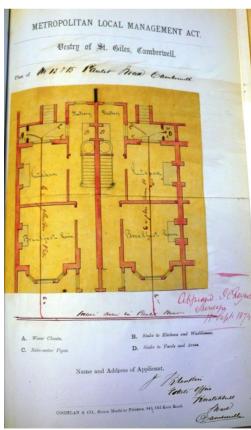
Plan for building application to the District Surveyor for 13 & 15 Paulet Road, 1874.
